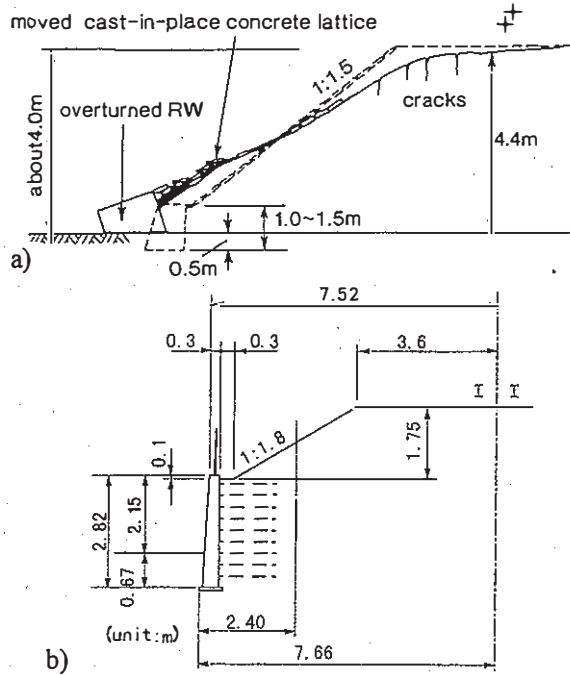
Cross-sections of a) a typical damaged south slope of the embankment and b) a GRS-RW by reconstruction, between Setsu-motoyama and Sumiyoshi Stations, JR Kobe Line (ES1 in Fig. 4).
